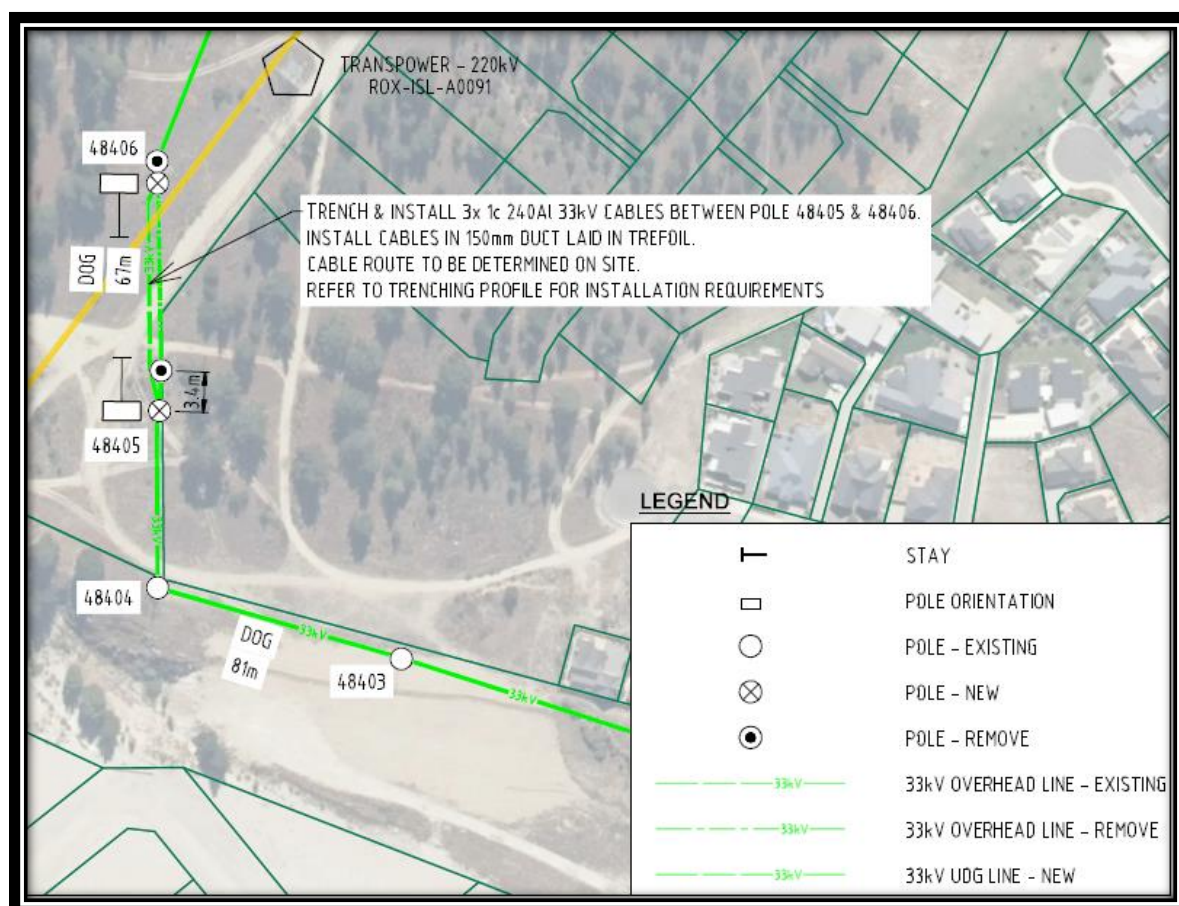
Plan of proposed works (to underground a section of Aurora's 33kV lines)
